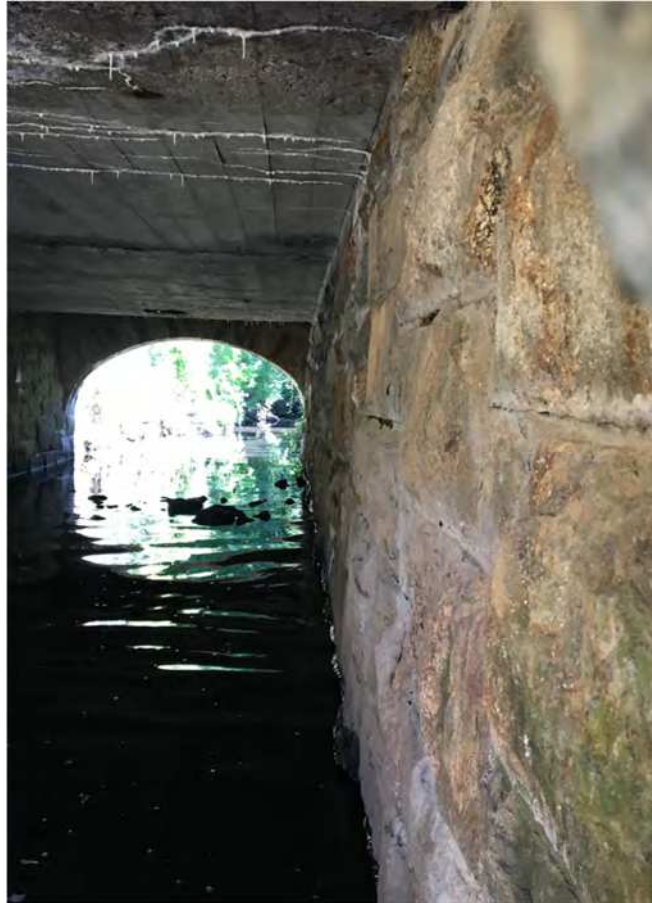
Horizontal and vertical alignment of the barrel (south wall shown, north wall similar).
